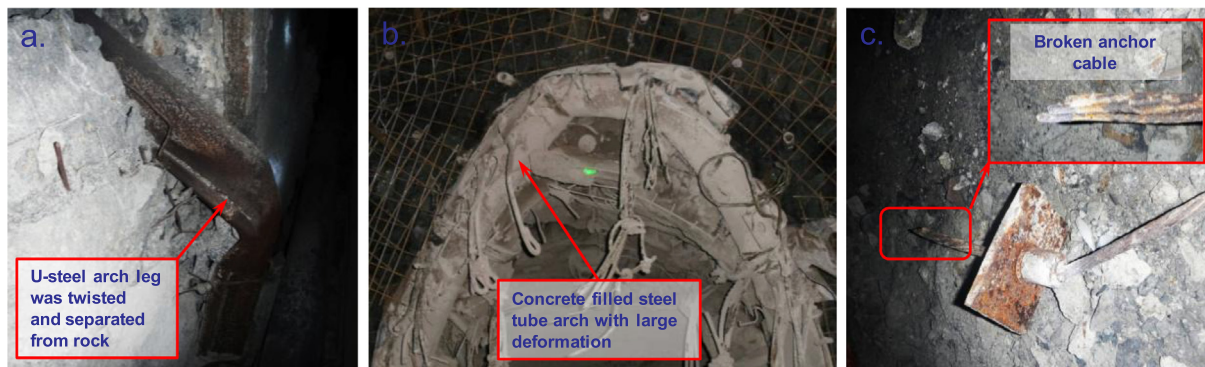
Typical failure cases of roadway tunnels supported by arch-bolt union style. (a) roadway supported by U-steel arches in a coal mine in east China; (b) roadway supported by CFST arches in a coal mine in west China; (c) broken of anchor cable in a coal mine in mid-eastern China.
